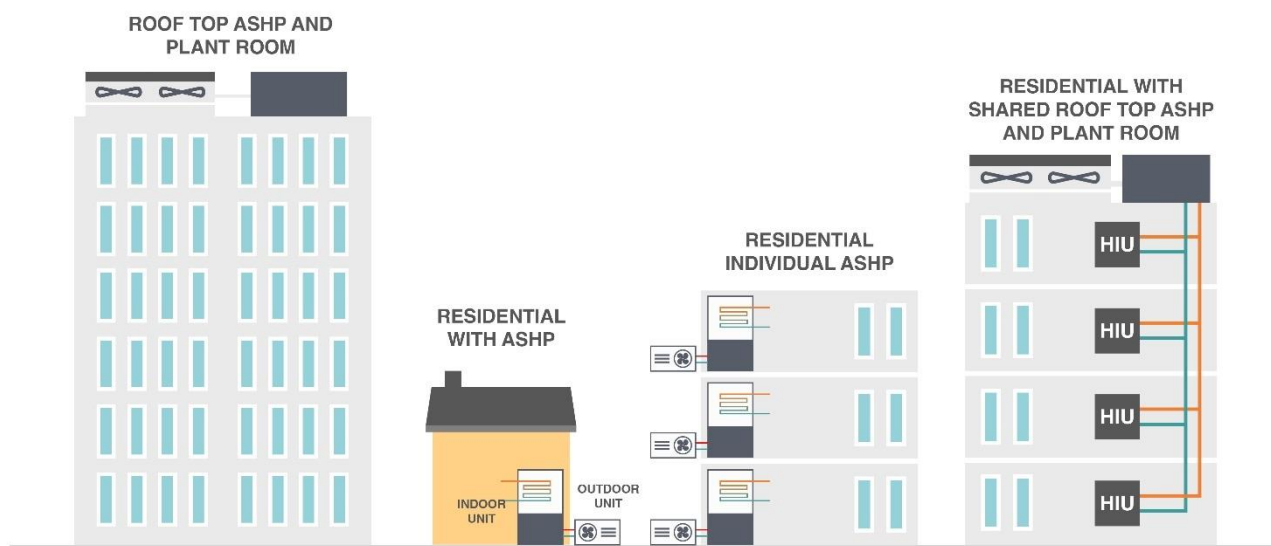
Indicative arrangement of ASHPs at each building to provide heat and cooling
